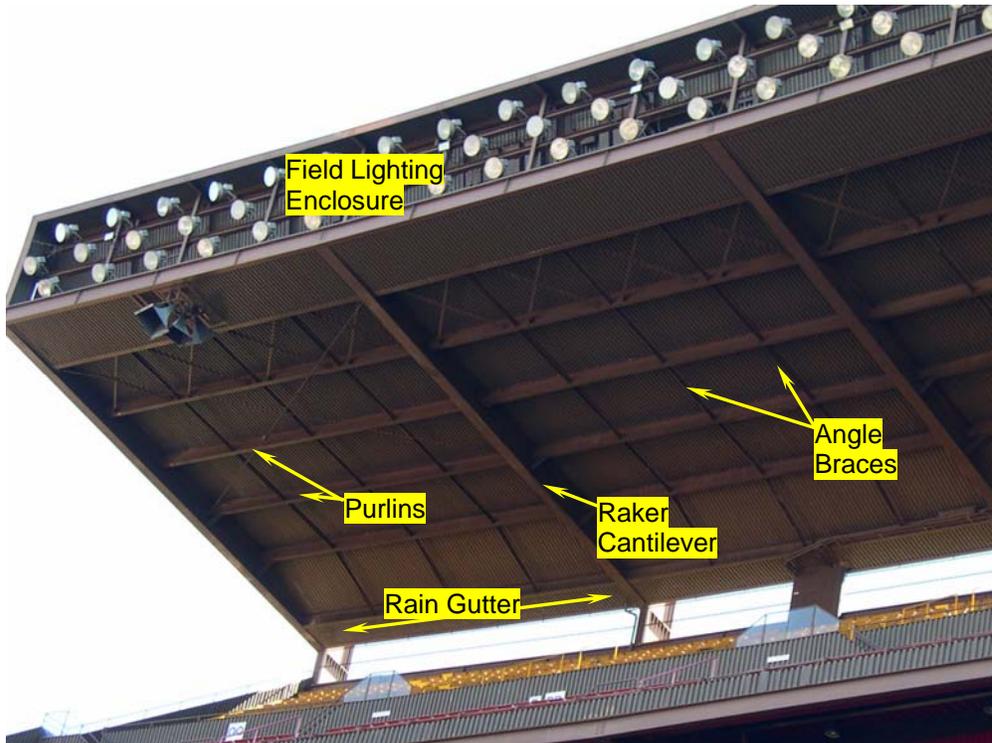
Typical structural framing for the roof canopy, viewed from below
